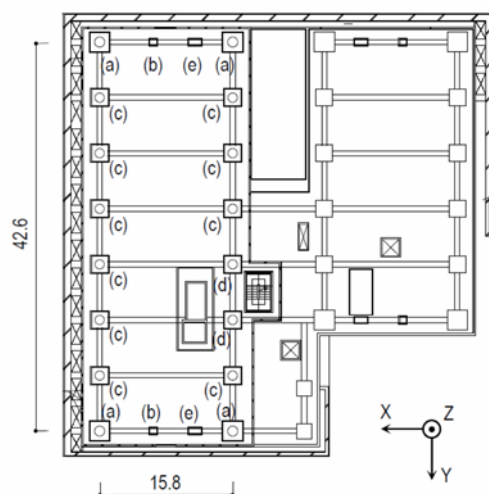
Isolation floor plan of the J2 base-isolated building
